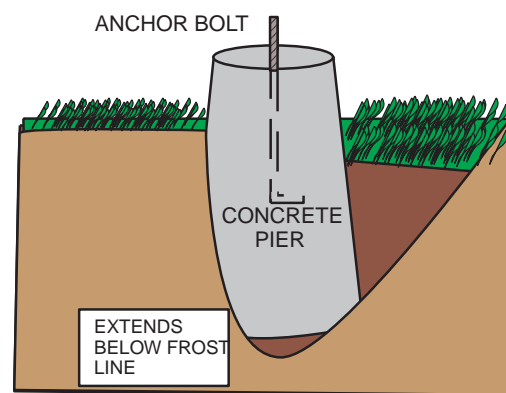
Site preparation for installation of a cast-in-place pier.
